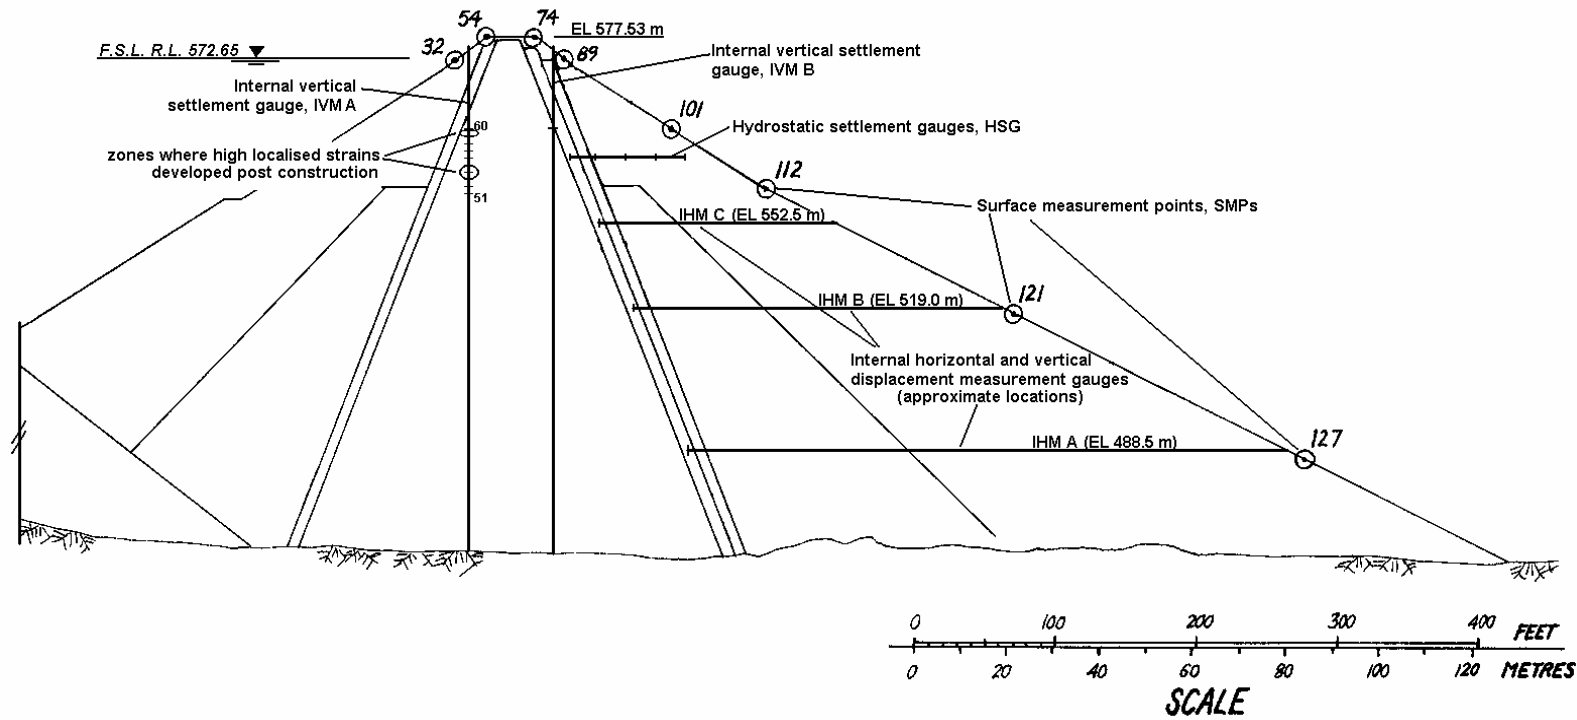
Copeton dam; deformation instrumentation at the maximum section (courtesy of New South Wales Department of Land and Water Conservation).
